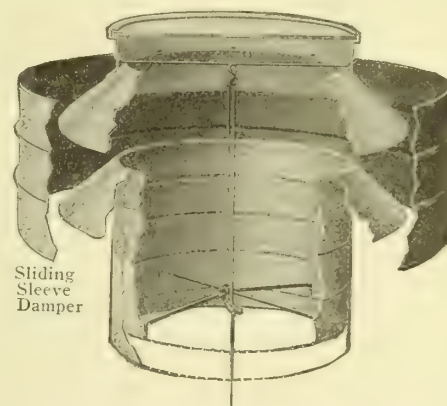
SECTIONAL VIEW OF "BURT" SLIDING-SLEEVE GLASS-TOP VENTILATOR
